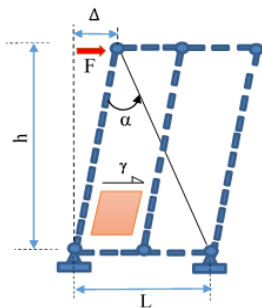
The zone of measurements by camera in timber walls filled with hemp concrete.
